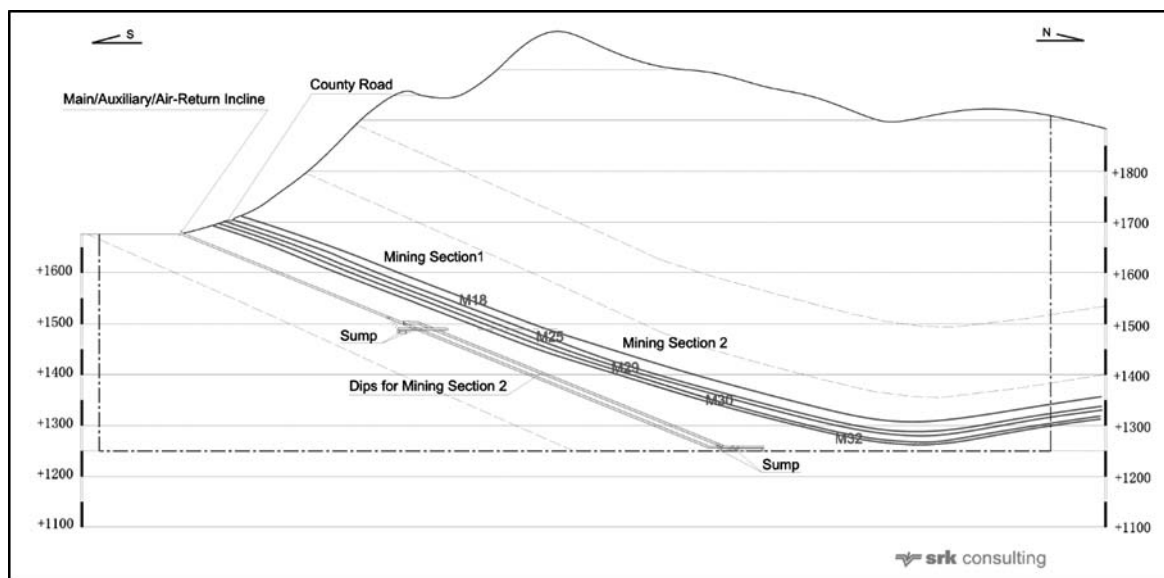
Typical North-South Cross Section through Weishe Mine
